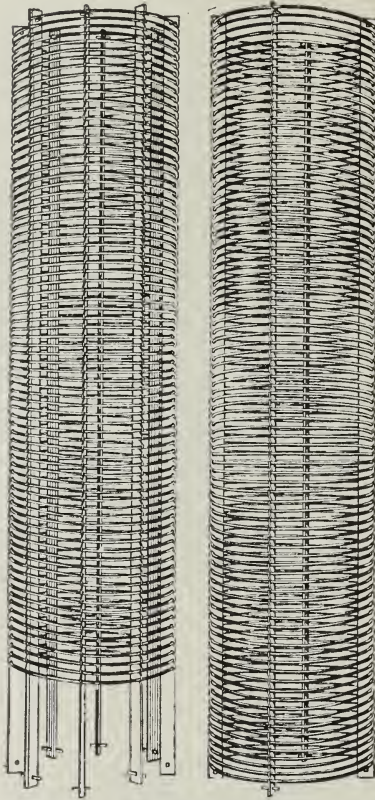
Column Reinforcement. Patented Spiral Wire.
